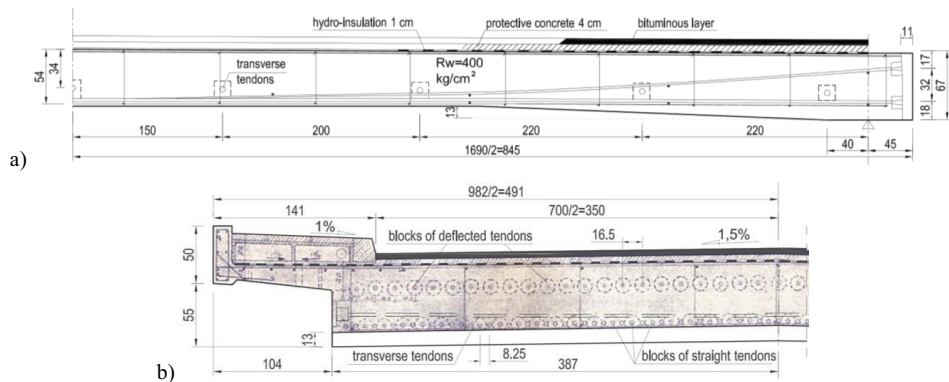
Prestressing tendons a) longitudinal cross-section, tendon tracks b) slab end view, tendon anchors.
